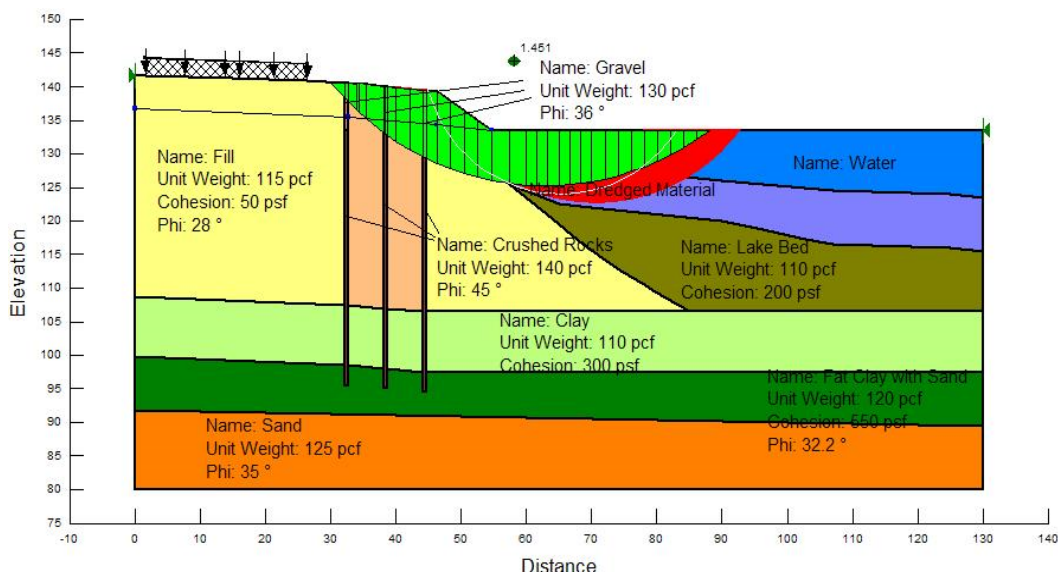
Slope stability with stone columns [Note: Elevation and Distance are in Feet](#)
